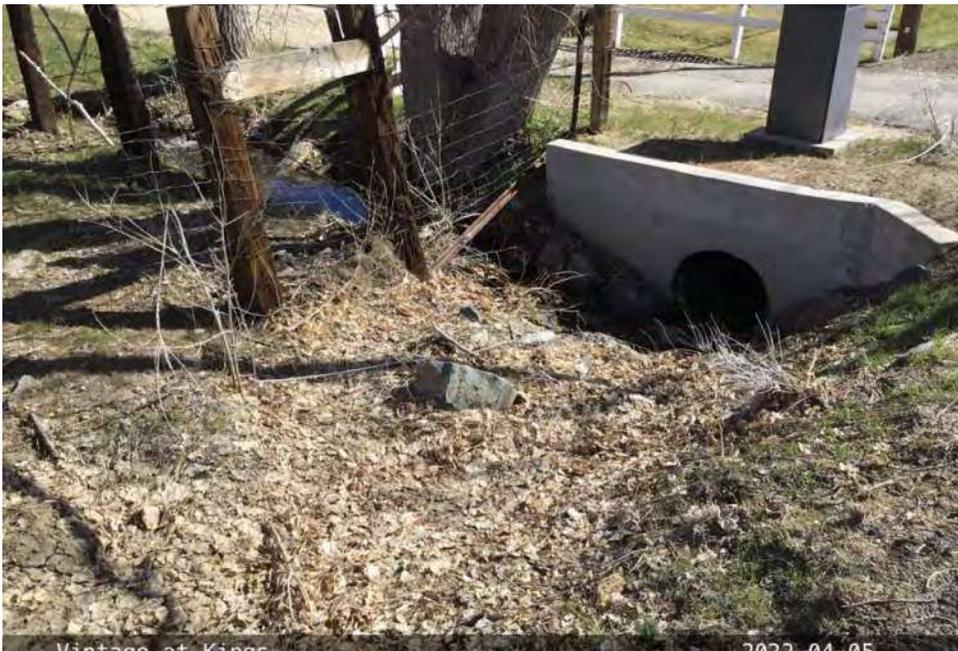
AR-3 at southeast corner of Survey Area where waters, when present, exit off-site into storm drain. View looking northeast.
